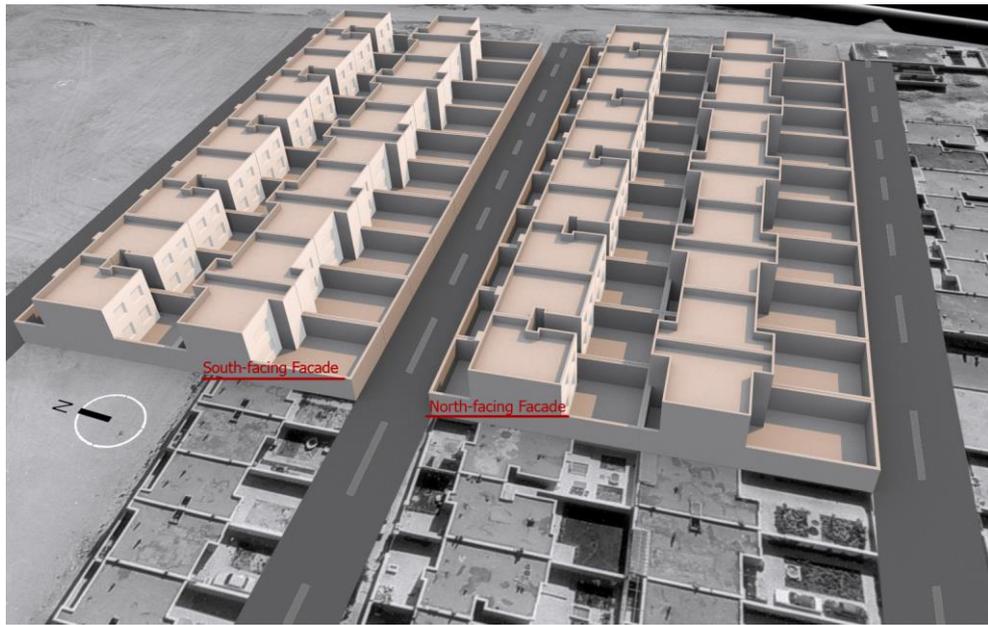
The walls around the yards separated buildings from each other and the street. source: (author, 2018)
